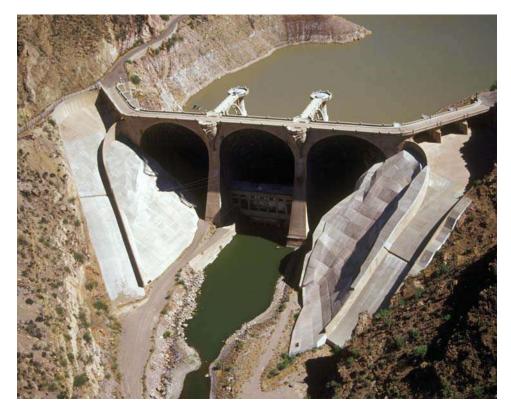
Aerial View of Overtopping Protection at Coolidge Dam (Reclamation).
